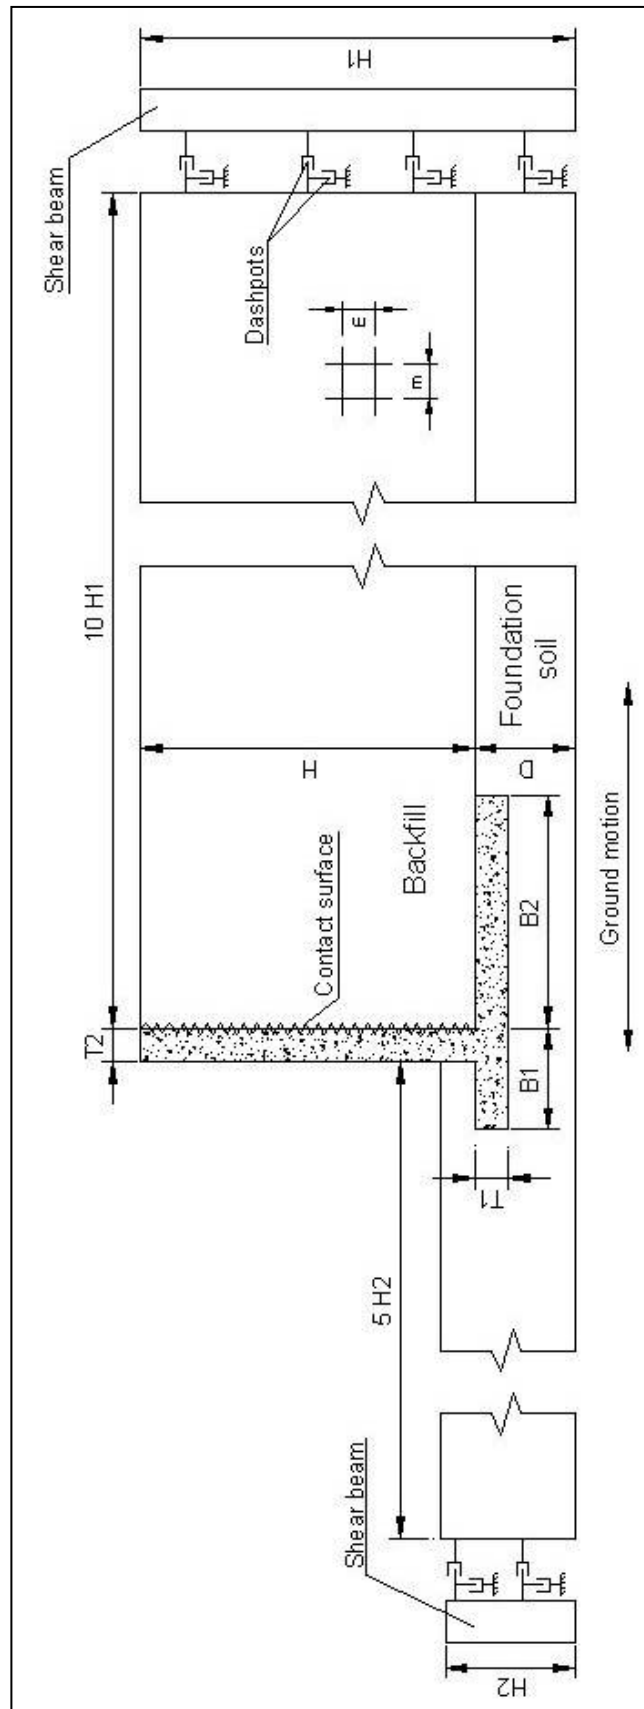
Typical model for the cantilever wall analyses
